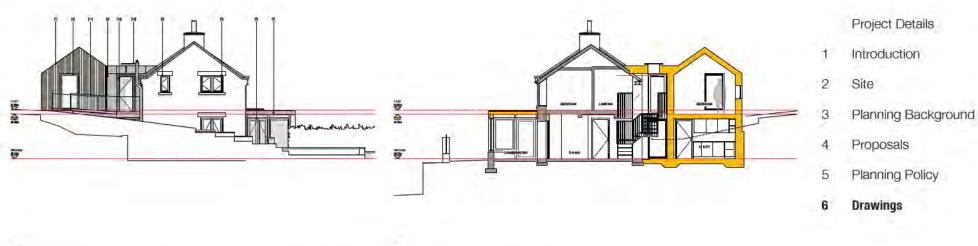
PL_002 Proposed Elevations and Sections: Sheet 1 (not to scale)
